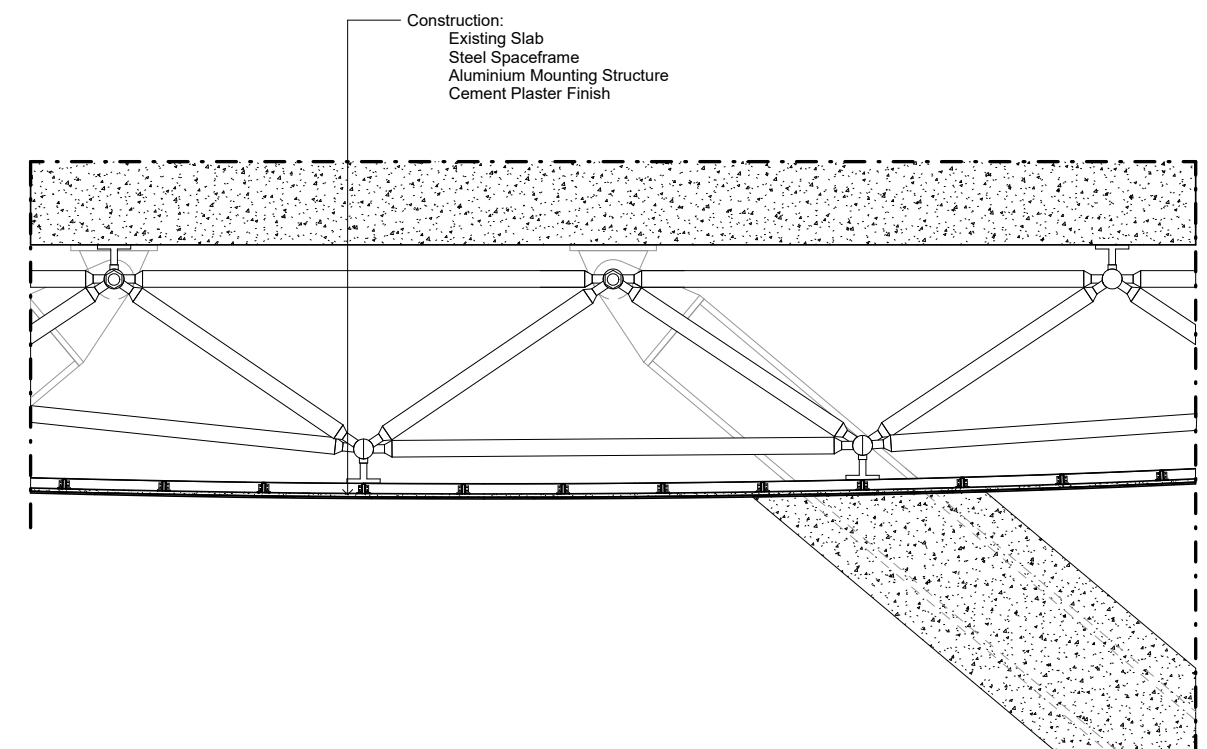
Detail Drawing of the connection of the new structure with the existing slab
